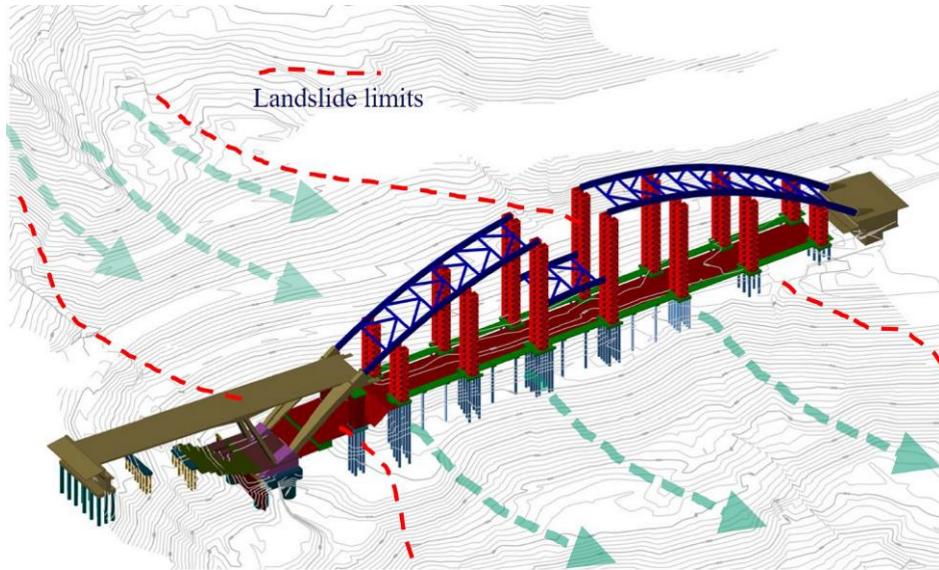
Arch erection of the Tsakona Bridge using temporary steel towers.
